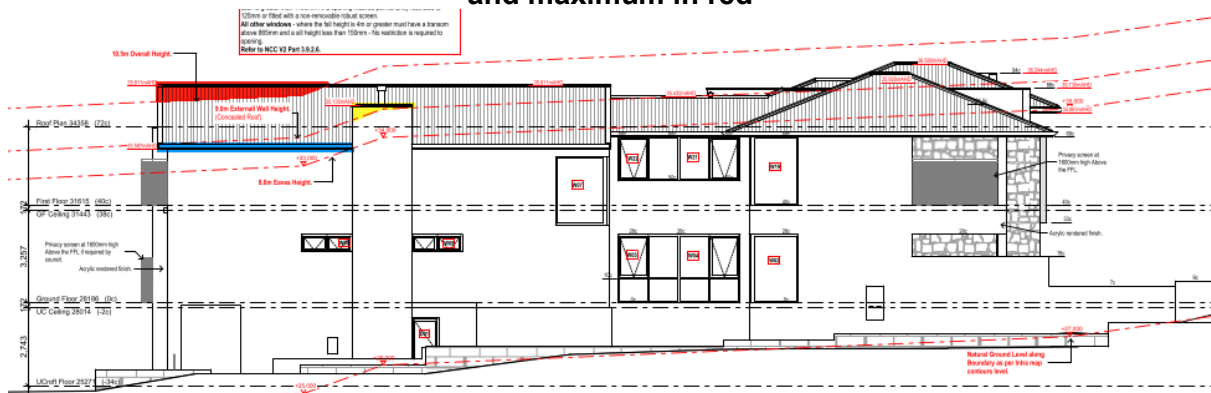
Western Elevation of 6C Cowrie Crescent. The areas subject of this assessment are highlighted as follows: Eave height in blue, concealed roof in yellow and maximum in red
